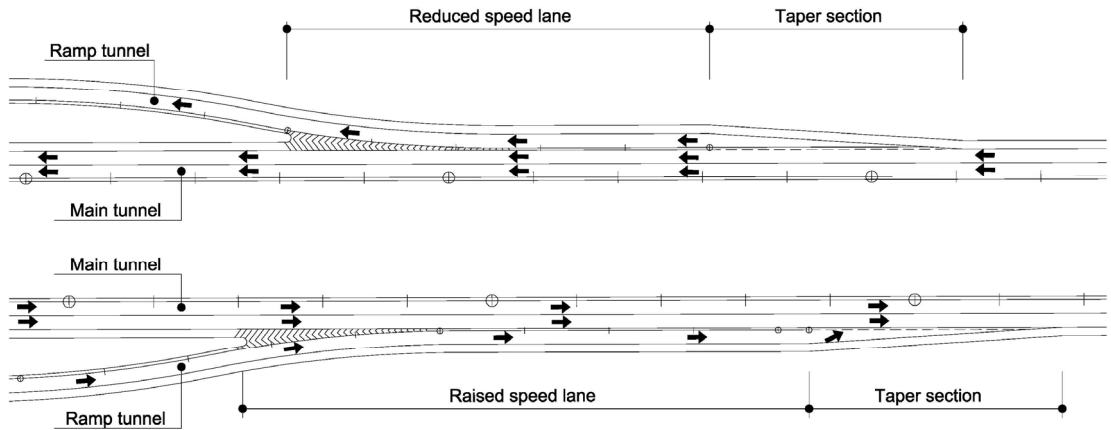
Road alignment plan in branch section- reduced speed section (up), raised speed section (down)
